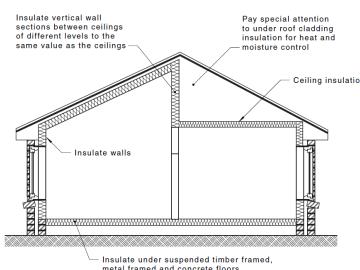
EXAMPLE OF THERMAL ENVELOPE WITH SUSPENDED FLOOR
